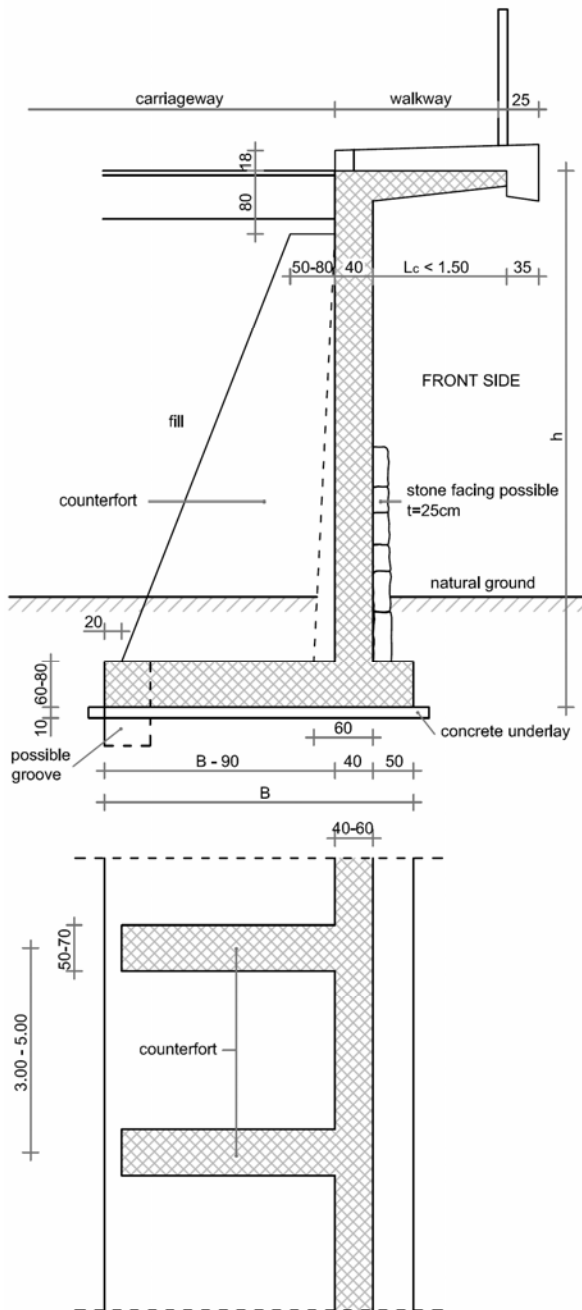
Angular reinforced concrete gravity supporting wall, with counterforts
